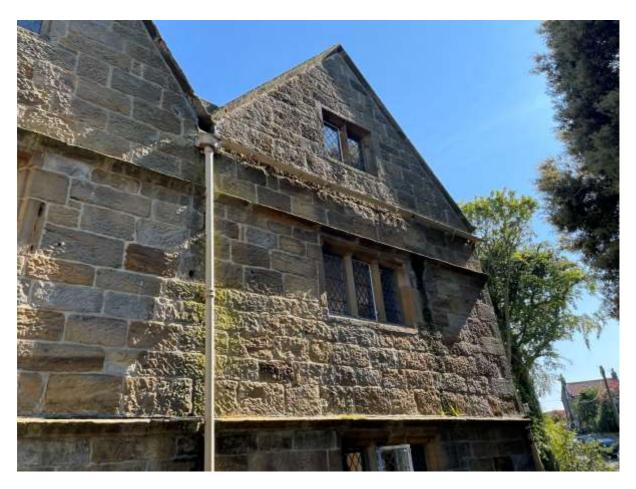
Northwest Elevation of 'Original House'. Horizontal guttering above first floor level to be removed with new downpipe installed to northwest / southwest corner. Existing valley downpipe to be renewed.
